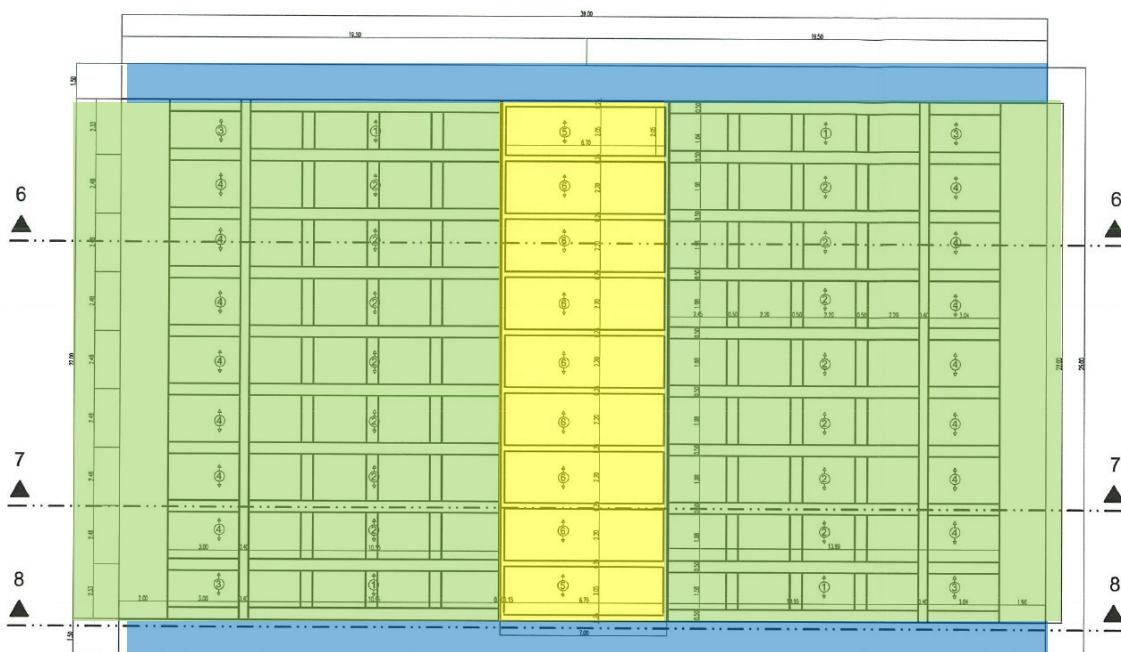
Disposition of arch cantilever slabs (green), simple beam slab (yellow) and cantilever side slab (blue) in plane of the bridge (bottom side)
